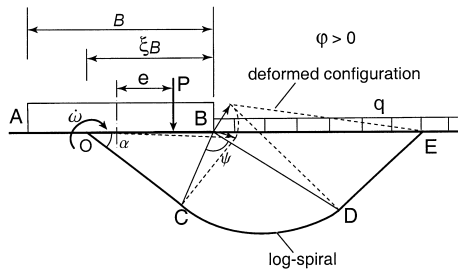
Failure mechanism of a smooth footing over cohesive-frictional soil (footing rotation, simple shear under the footing).
